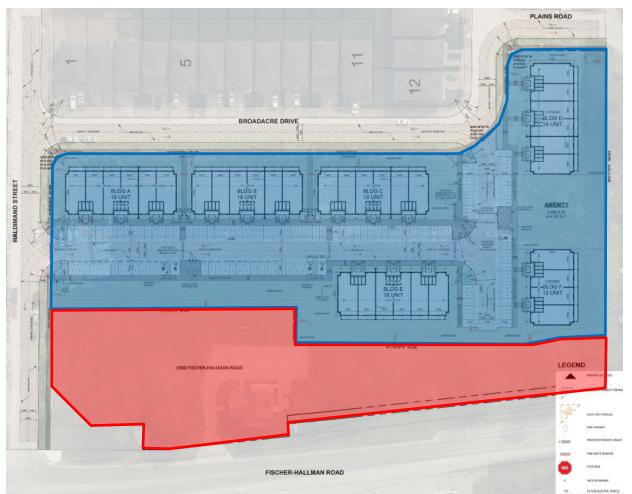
Aerial photo noting the location of the subject property at 1940 Fischer-Hallman Road with the Stage 8 lands noted in red and the Stage 6 lands noted in blue. (MHBC, 2024)
